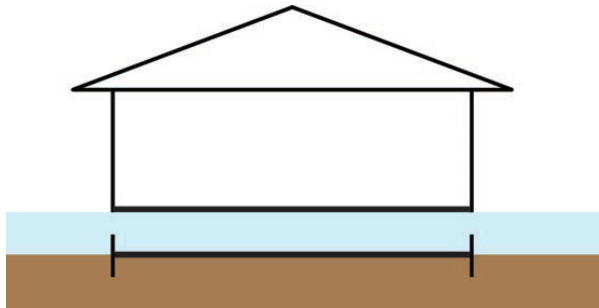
Wet Floodproofing New Construction* (NYC Department of Planning 2013a)
